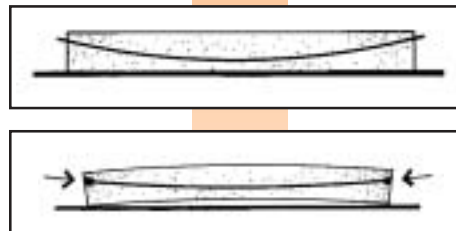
The concrete does not bond to the steel rods during curing. Fig. 4-11b After the concrete has cured, the steel rods are tensioned with a hydraulic jack and anchored to the ends of the slab
